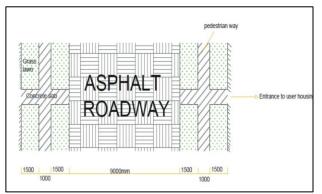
Plan of a hypothetical design of a trenchless drain on a road plan.
